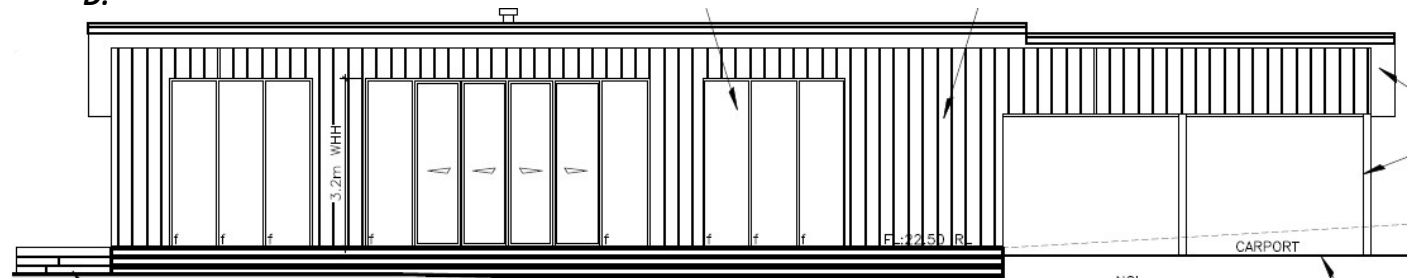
North Elevation– Damian Anderson Drafting and Design
